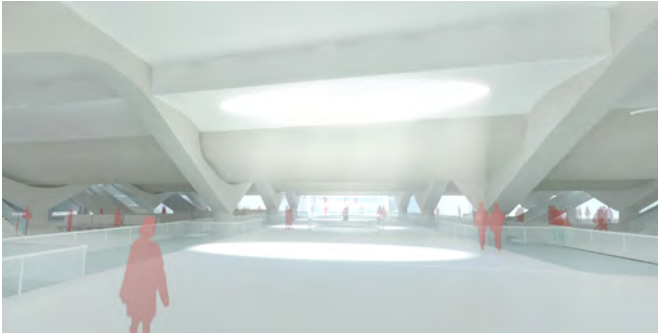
View looking east along H Street Concourse towards the Second Street entry.
